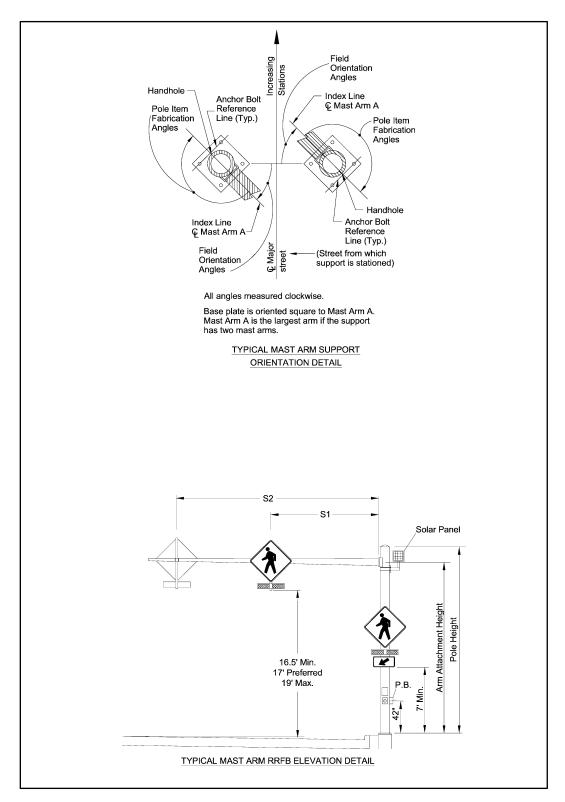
Typical RRFB Mast Arm Fabrication and Orientation Details
